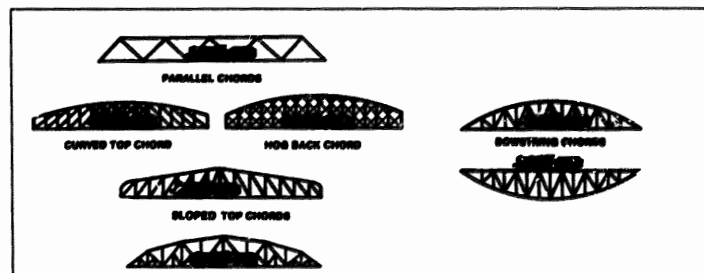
Basic truss shapes. The arrangement of tension and compression members within the truss determines the actual truss type.
